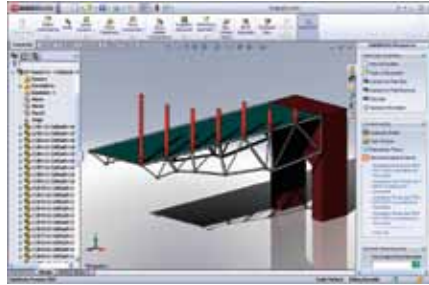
A SolidWorks CAD model showing a truss design supporting a loaded bridge. The required size of the truss tubes depends on the coordinates of the truss nodes and the placement of the loads.
